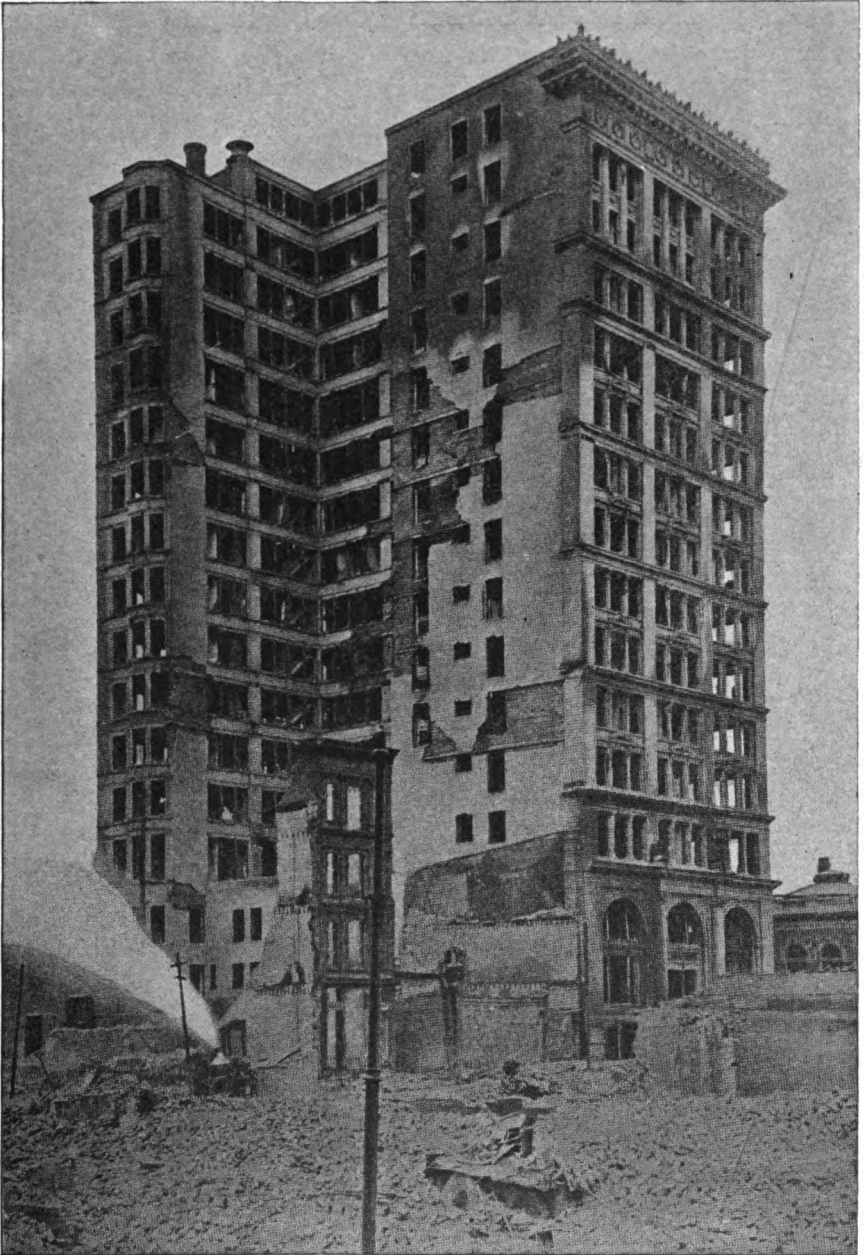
Unprotected Side Windows Gave Access to Fire; the Interior Entirely Guttred
